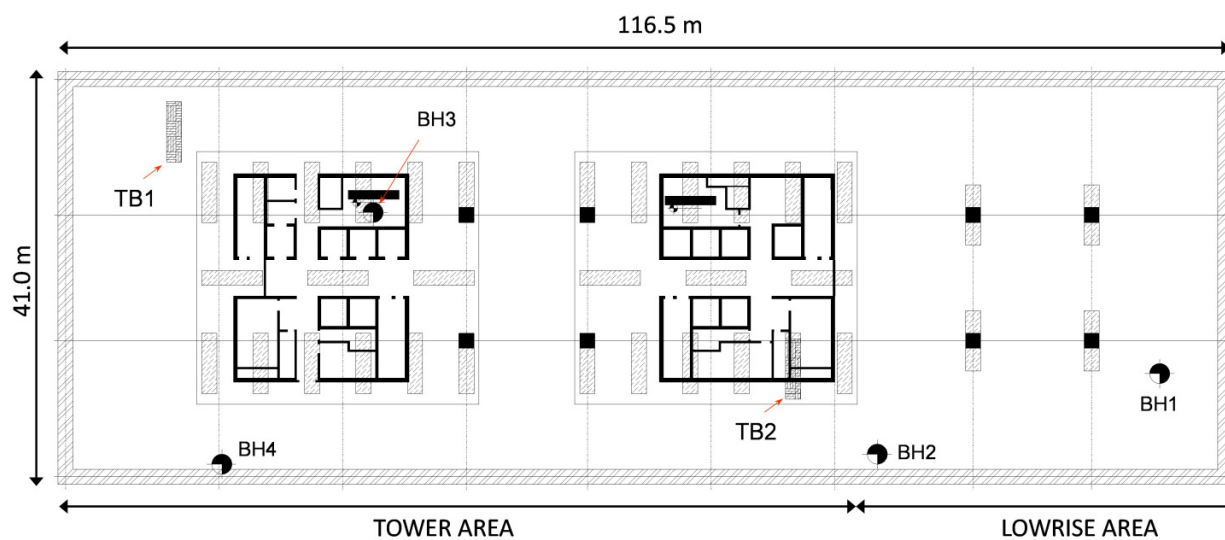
Site plan and locations of test barrettes TB1 and TB2.
